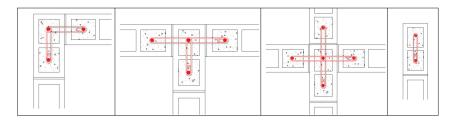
REBAR TIES (R6@400) AT WALL JUNCTIONS AND END
